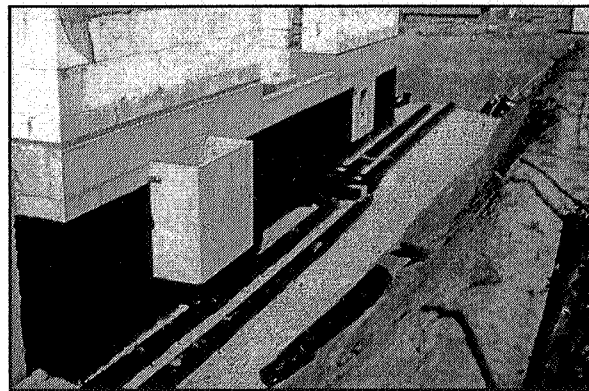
The earth coupling system. The pipes are placed in the regular excavation around the building.
